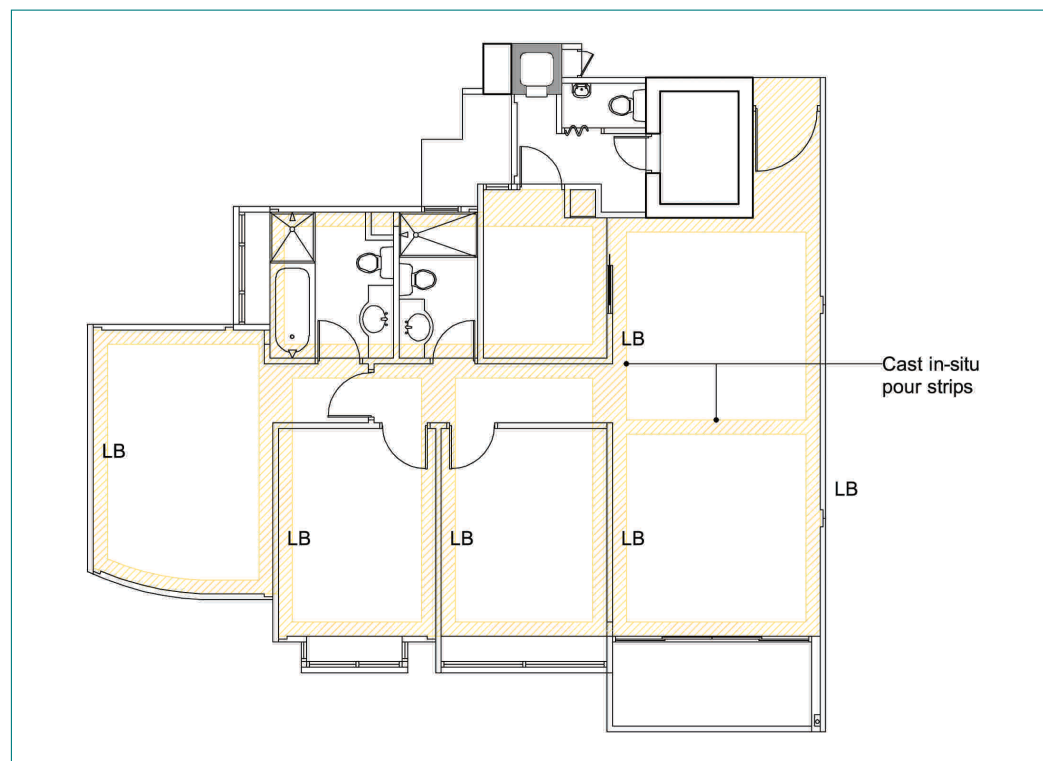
Layout using precast slab supported by load-bearing walls
